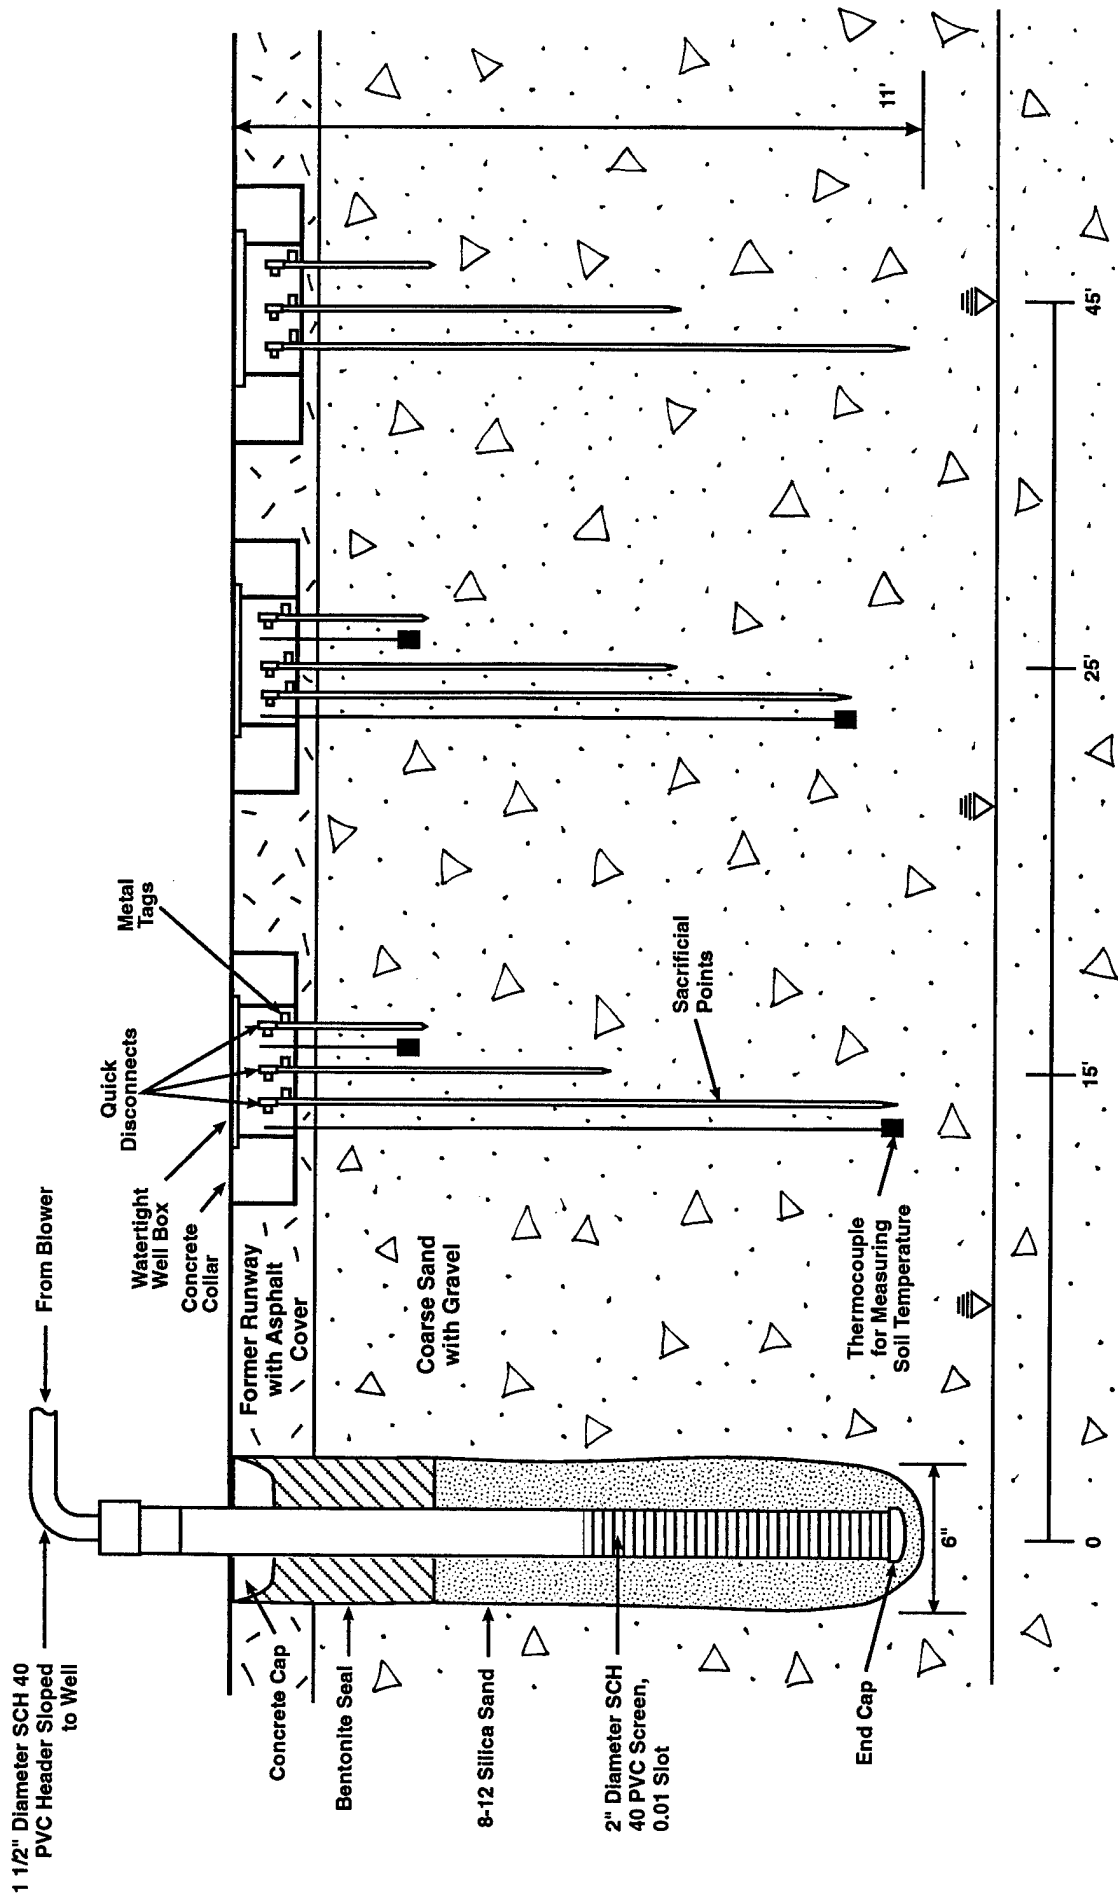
Cross Section of Vent Well and Monitoring Points at Site ST-04 Showing Site Lithology and Construction Detail (not to scale)
